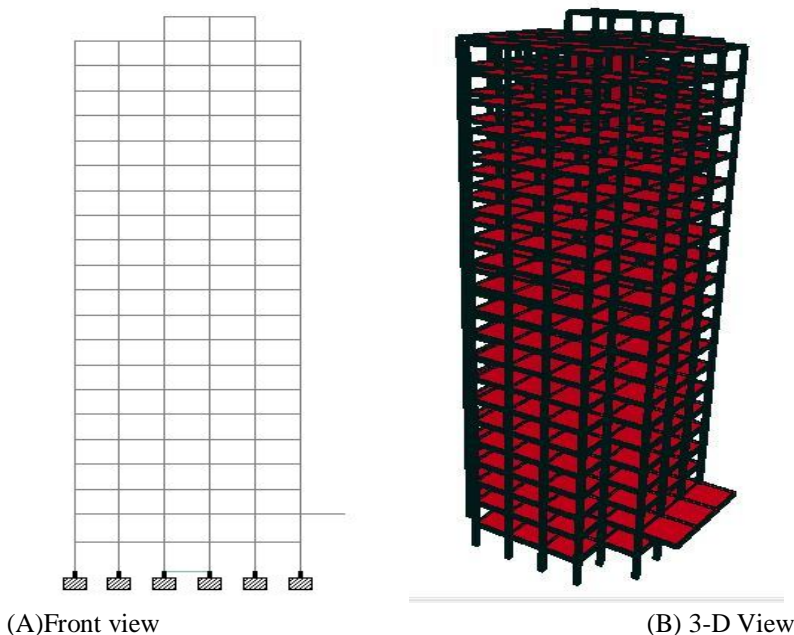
IRS Case 1- G+19 Storey Irregular Building with Offset on first floor in re-entrant corner building
